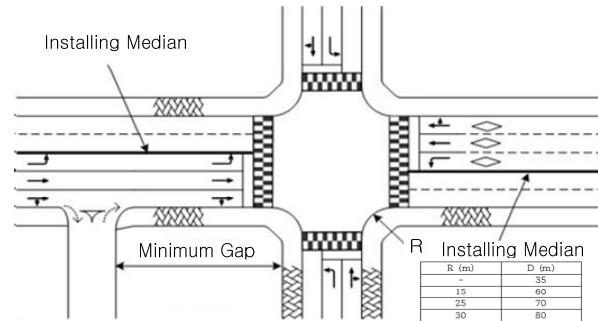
Minimum Length of Minor Road Adjoining Intersection
